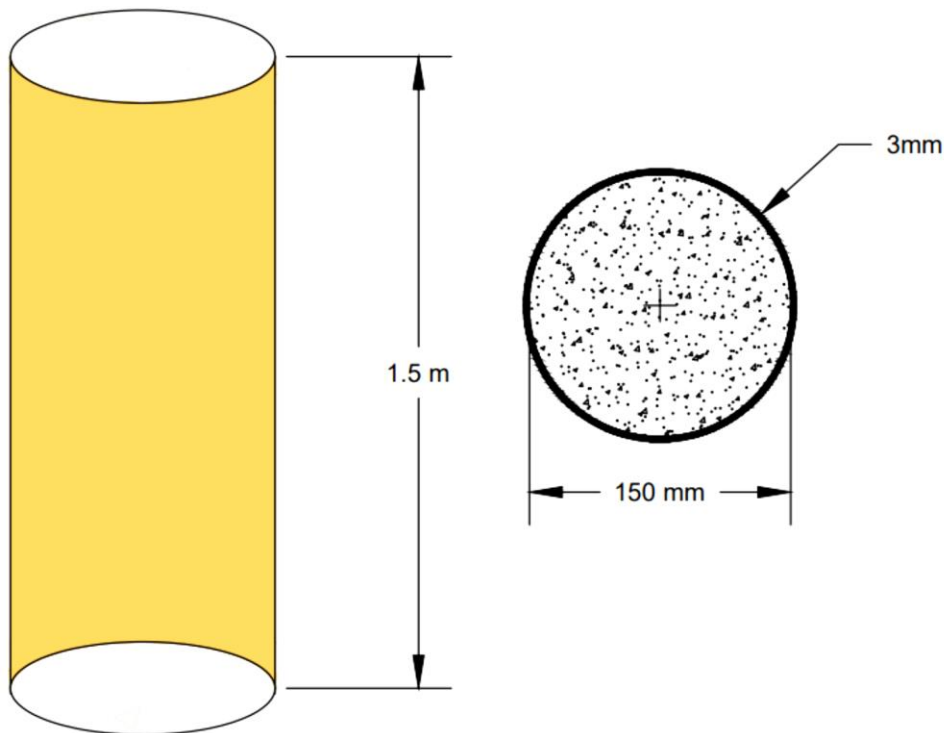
Showing steel tube and Top View of concrete filled steel tube.
